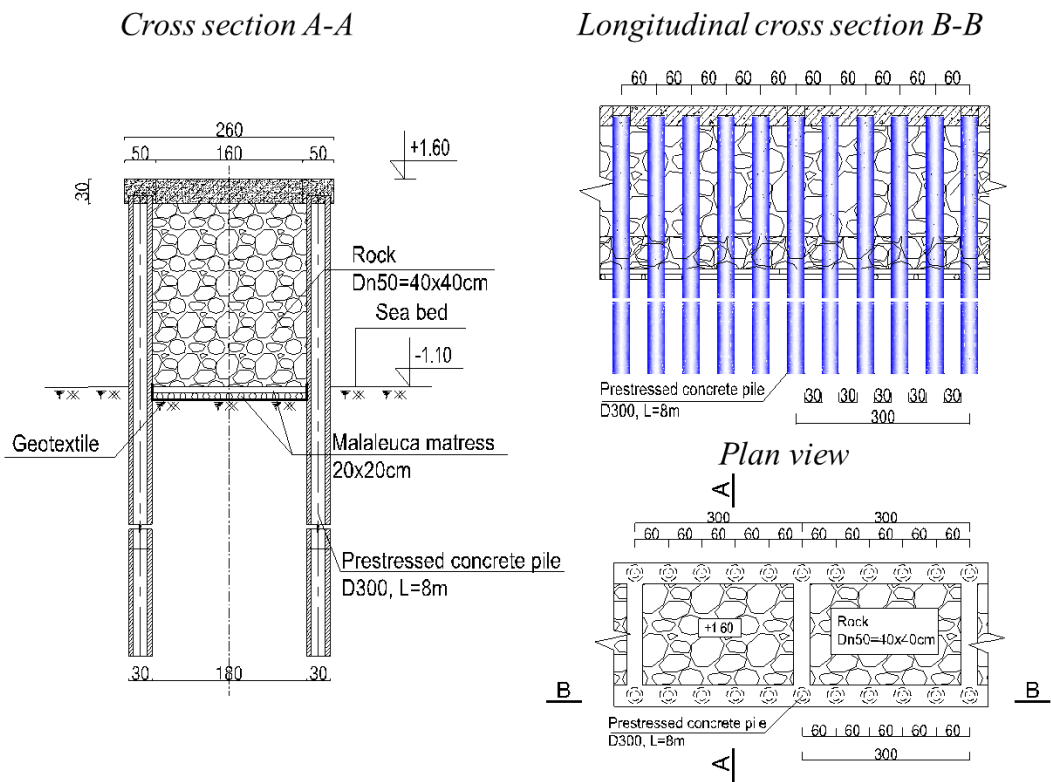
Cross-section, longitudinal, and plan view and dimensions of the Pile-Rock Breakwater (units: cm).
